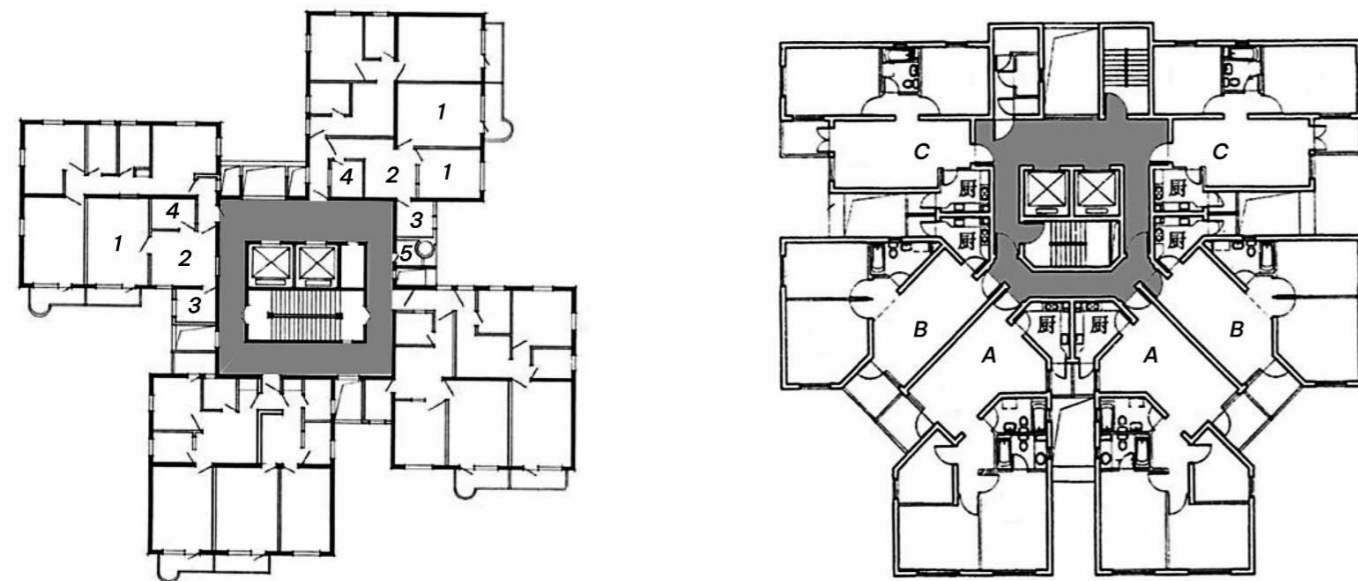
Floor plan of a 22-story building (1990) (picture left) and a 24-story building (1995) for reference (Source: Li Zhenyu, 2009)
